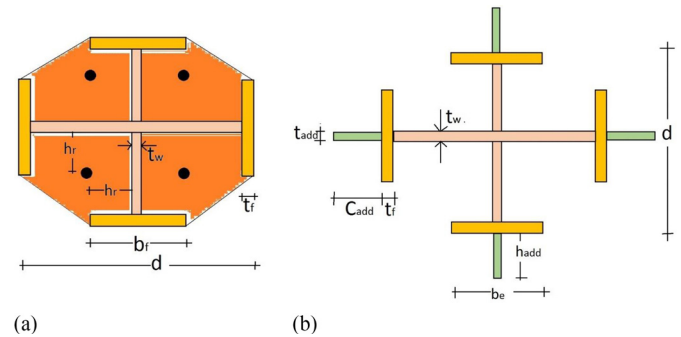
Simulation of composite steel-concrete cross section: (a) PEC cross section; (b) fictitious steel cross section
